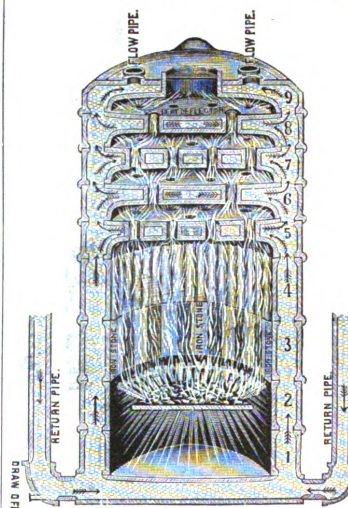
Sectional View of Boiler Made by Gurney Hot Water Heating Company.
